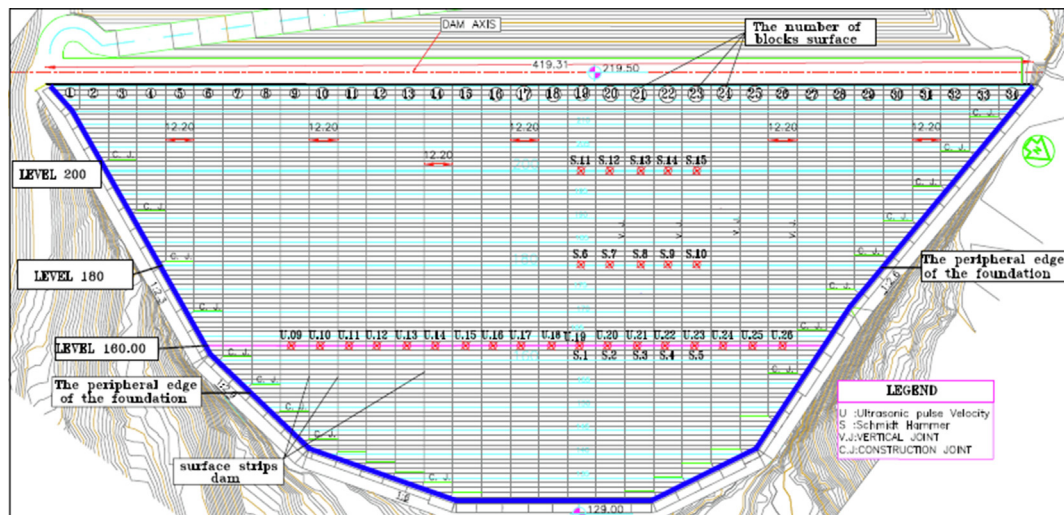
Concrete face plan of Bigar's reservoir dam [18].
